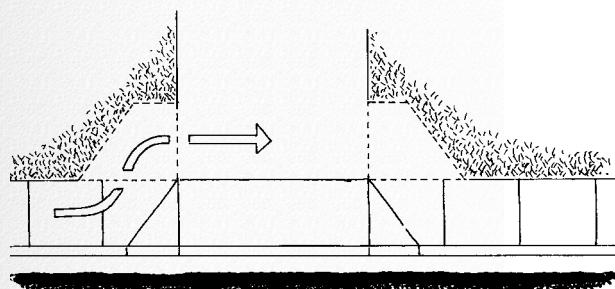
Additional right-of-way allows the sidewalk to be jogged back, providing level landings at driveway crossings and curb ramps.
